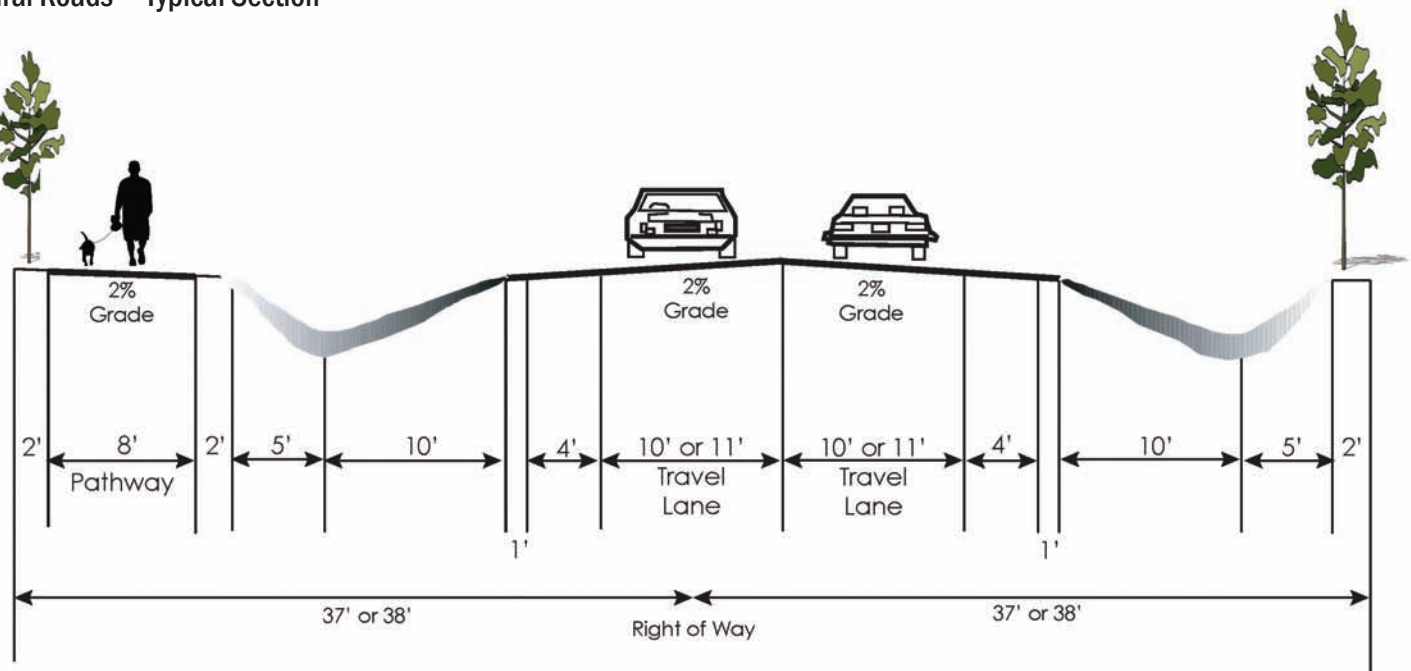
is the typical section for a rural collector. For local secondary roads, a typical section would have a 50-foot right-of-way and would include 20- to 24-foot surface widths (10- to 12-foot travel lanes), depending on average daily traffic (see Table 4.5). These local roads would include 2- to 4-foot shoulders, wide enough to accommodate pedestrians.
